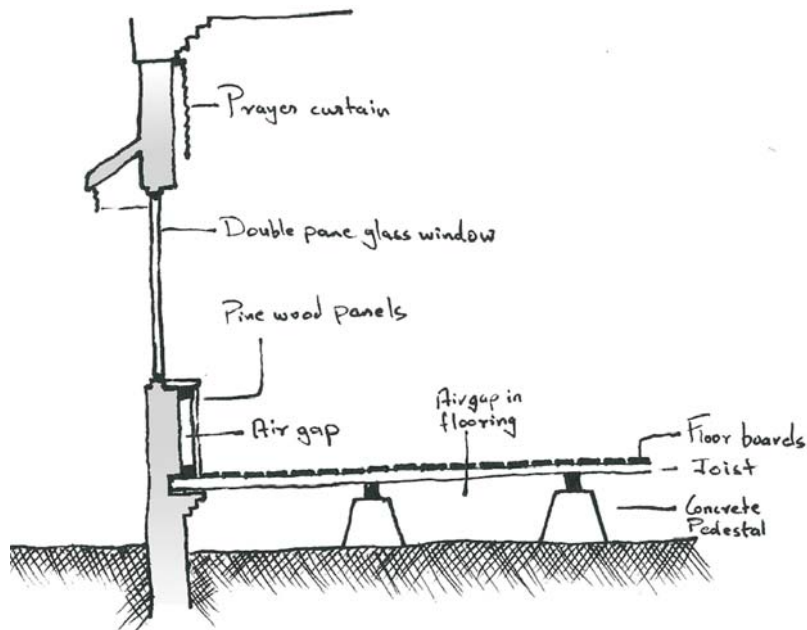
Schematic section showing the flooring detail - prayer hall of a Buddhist Monastery, Bomdila, Arunachal Pradesh - India (courtesy: Arch. Buland Shukla)
